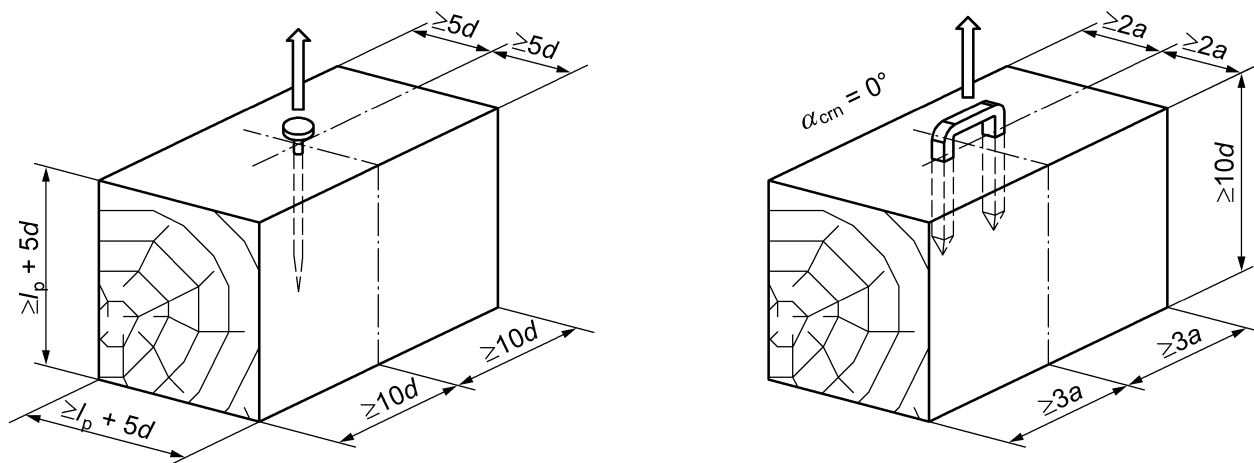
Withdrawal test pieces - load perpendicular to grain
